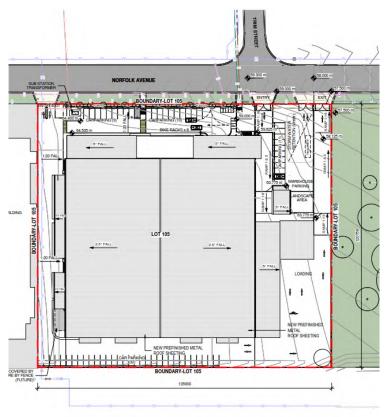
Extract of the Site Plan prepared by BN Architecture Urban Design Masterplanning Graphics Interior.
